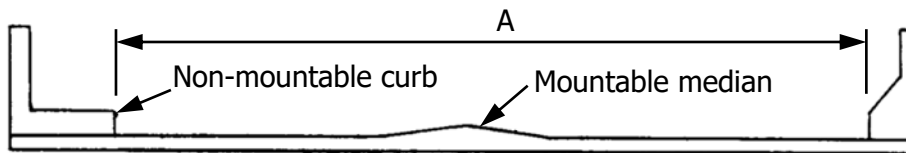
Cross-section view of a highway feature carried on the bridge with a mountable median.
